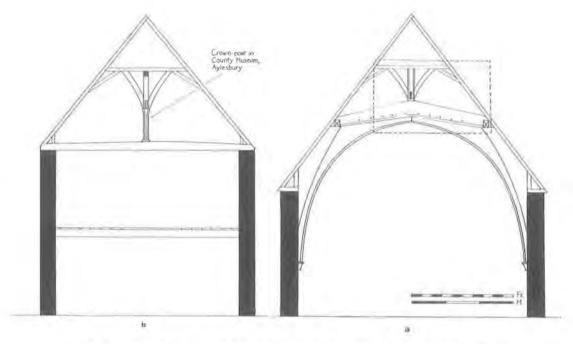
(a) Section through hall at A-A. Broken line defines frame of photograph.
